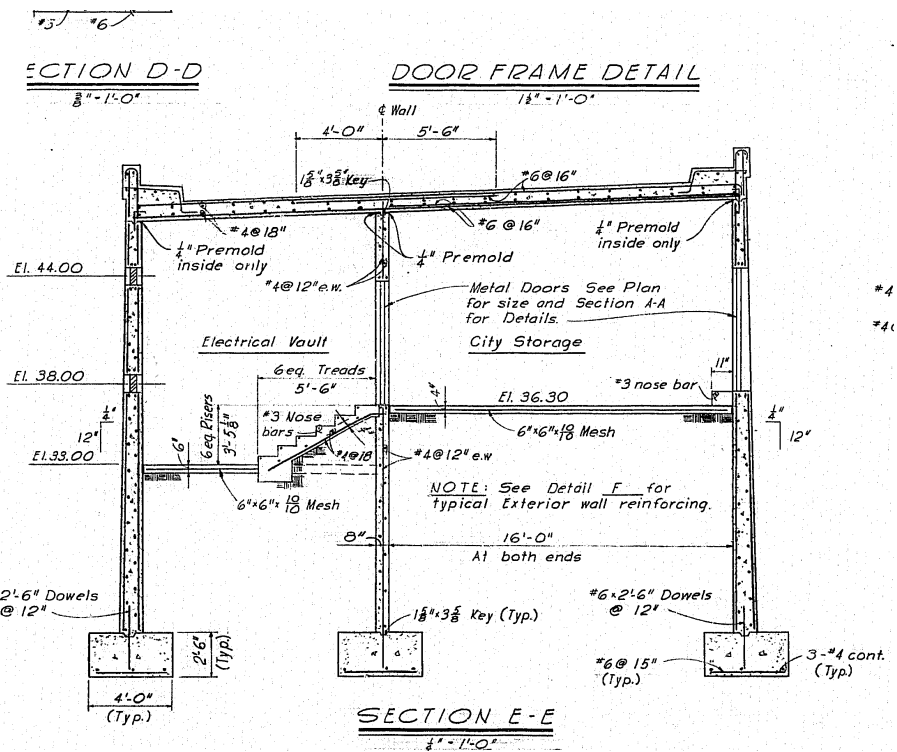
Abutment 3 Electrical Vault, thin wall with dowels connected to footing. Vault room could collapse and affect the electrical supply for Hawthorne bridge
